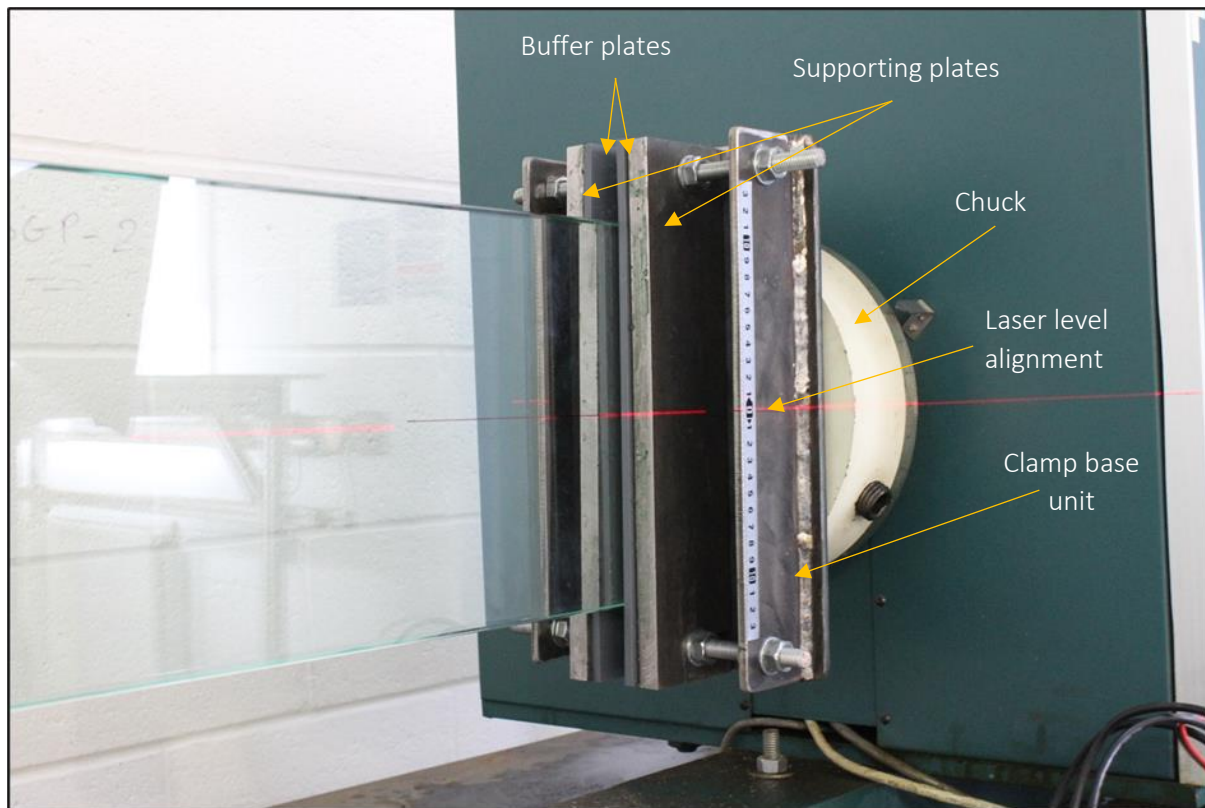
Tailor-made clamp system with steel supporting plates connecting torsion machine and test specimen.
